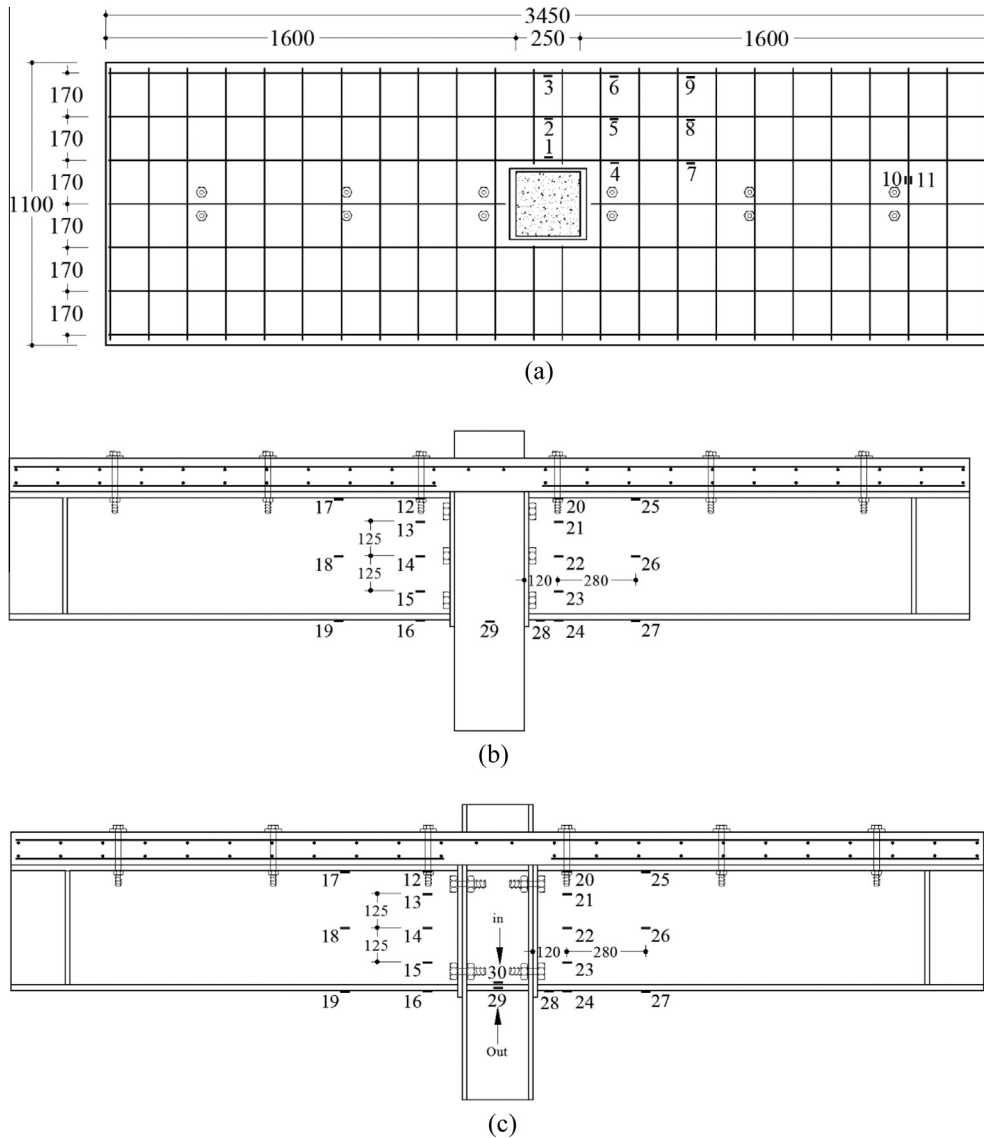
Layout of strain gauges (a) on reinforcing bars for all specimens and on steel beams and column, (b) for CJ1 and CJ2 and (c) for CJ3 and CJ4.
